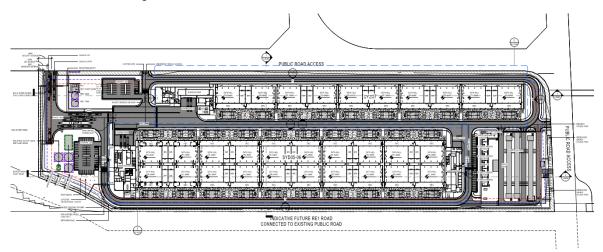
Site Plan (Greenbox Drawing No. A-D-1091 Revision 2 dated 15.03.2021)
